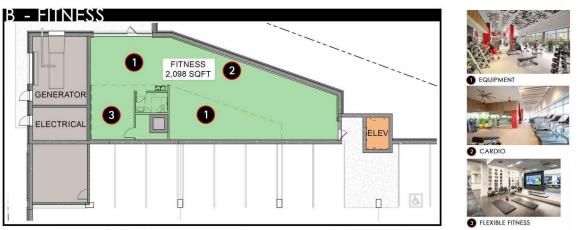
Level 1 floor plan with Fitness Center (Building 1)
